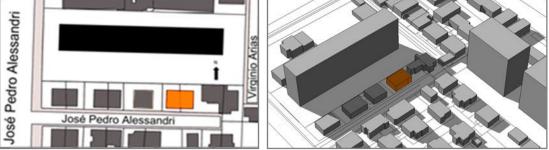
Plan and perspectives of larger and high buildings (black) and low houses. (yellow: isolated, two floor; red and grey: semidetached, two floors). Source: Vilches, 2014
